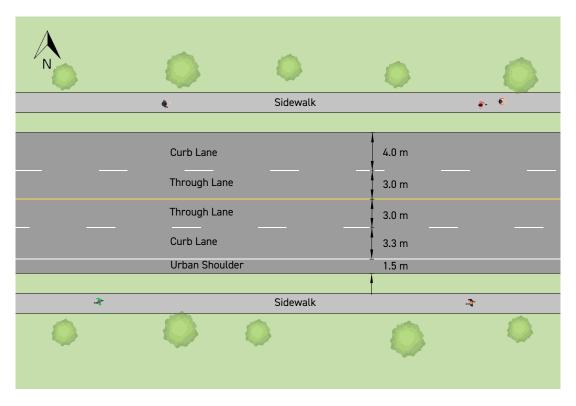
Example 6 - Configuration of Proposed Lane Widths
